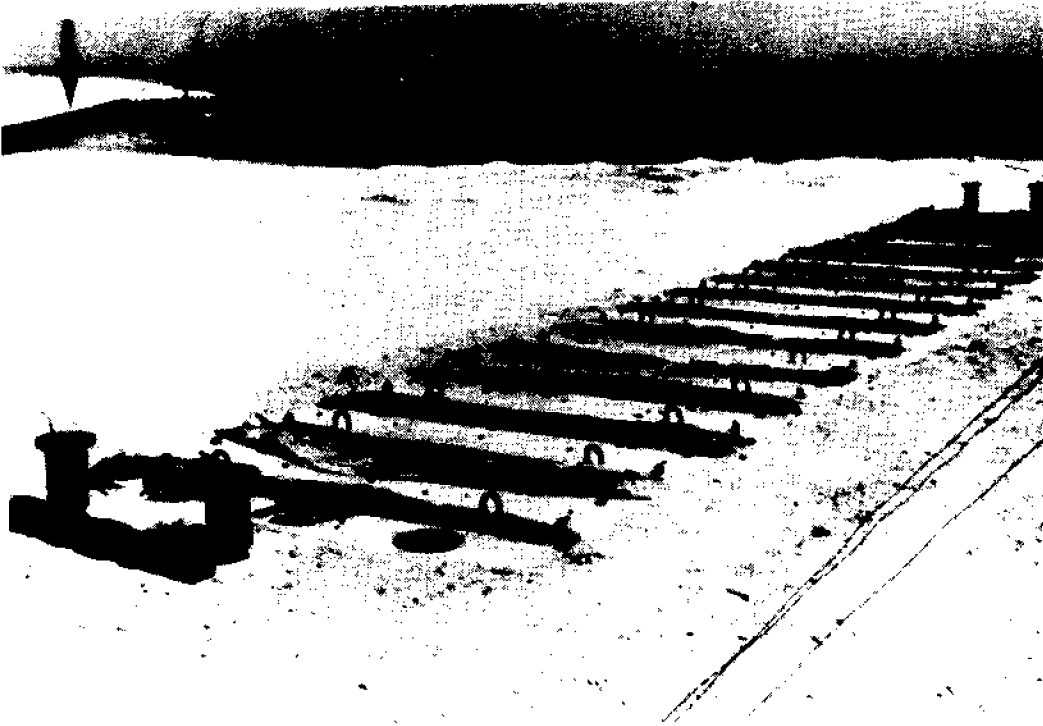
Cement test structure, shown in Figure 7, when it was 3.5 m above sea level a few days before the Koa test. Arrow shows railroad rails used in construction of roadway to left.
